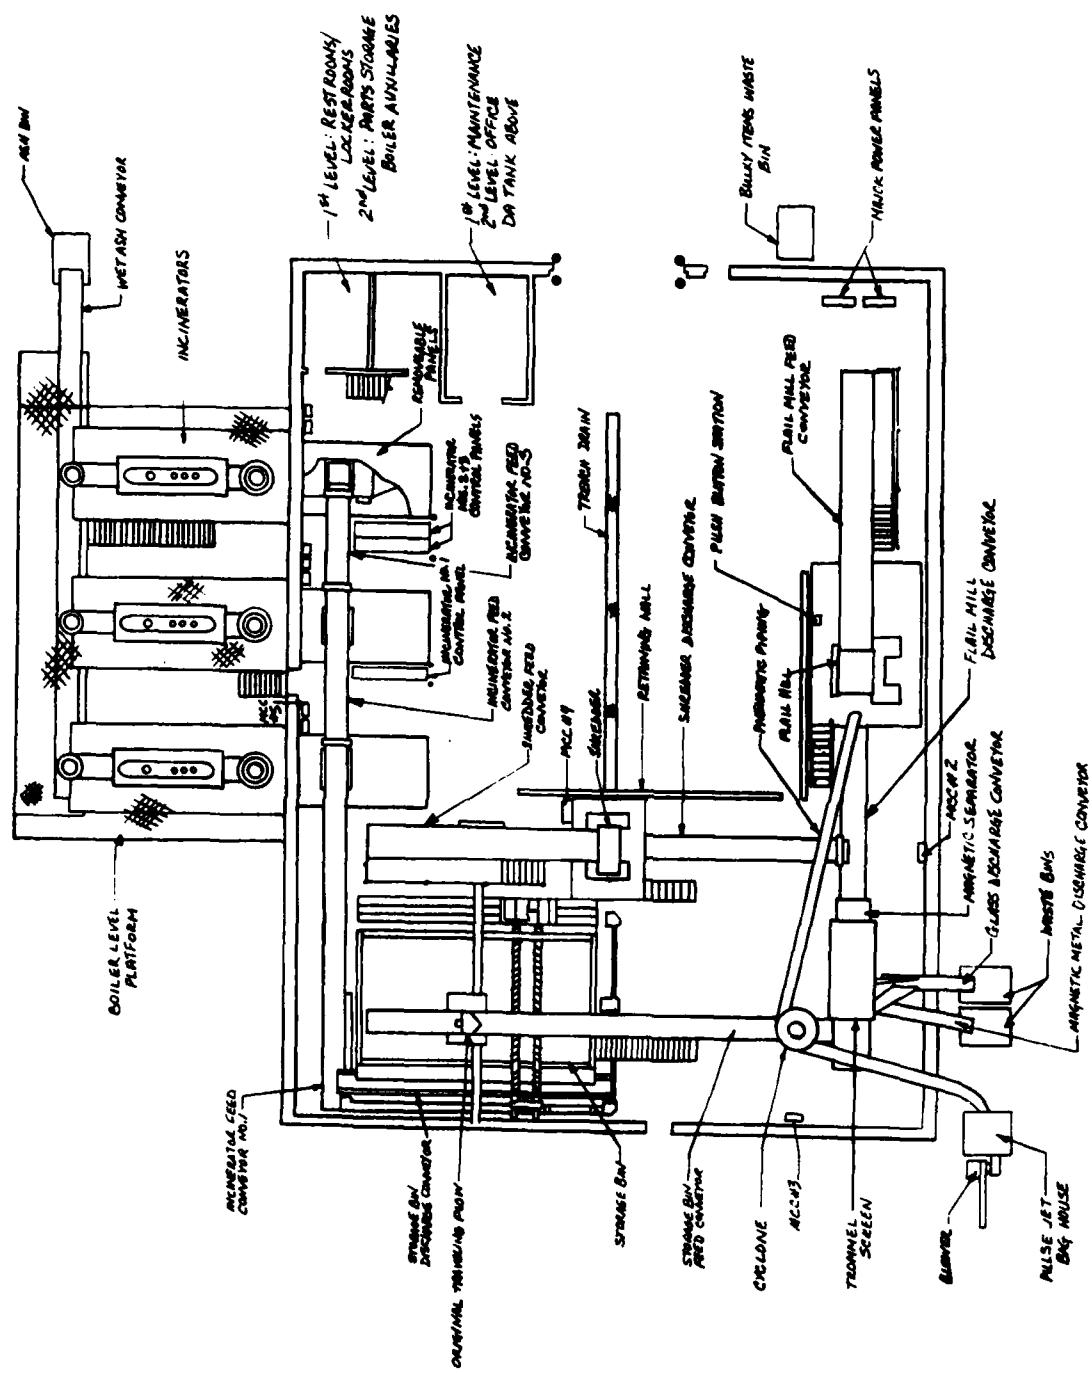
Layout of equipment at HRI, NAS Jacksonville. 17
